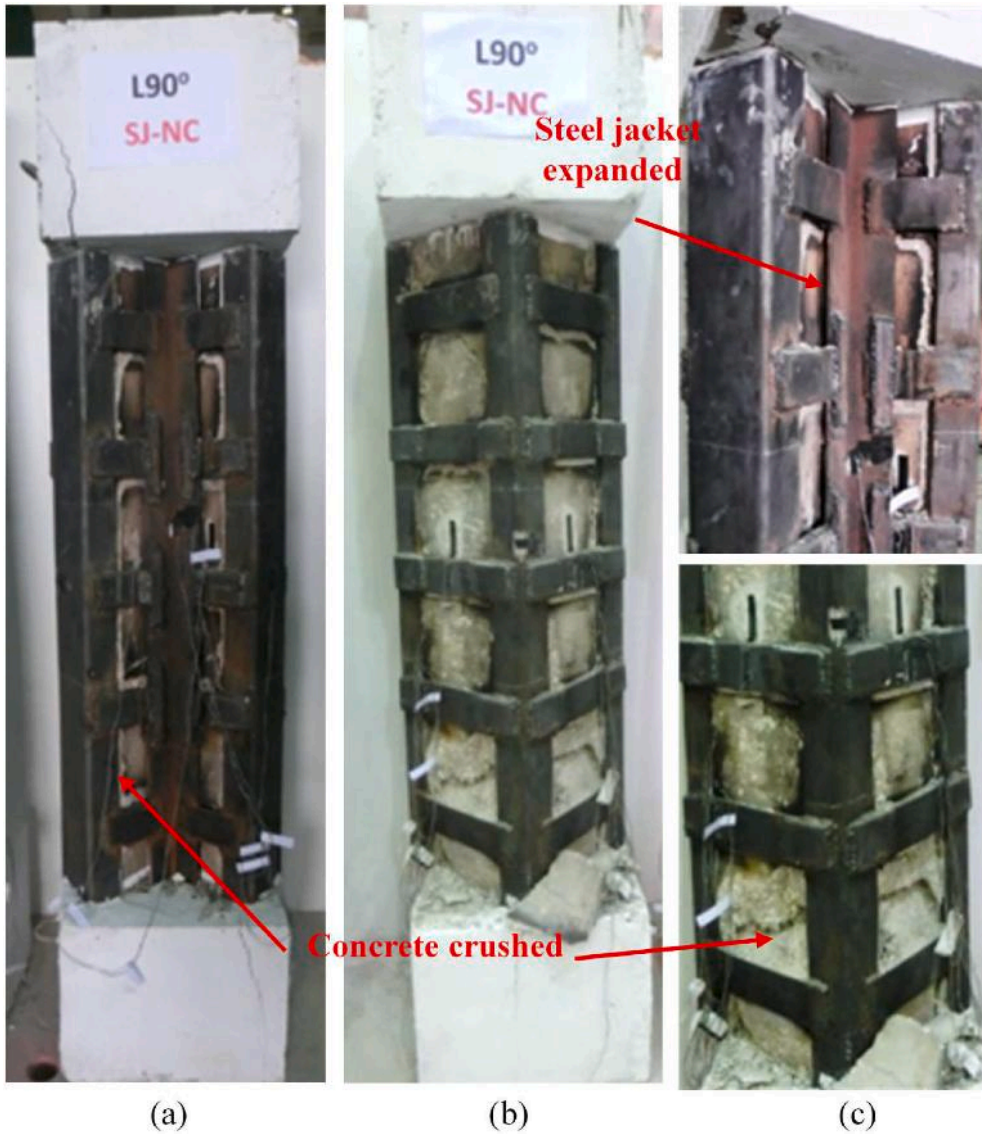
Failure of specimen L90-SJ-NC: (a) Elevation view; (b) Rear view; (c) Close view.
